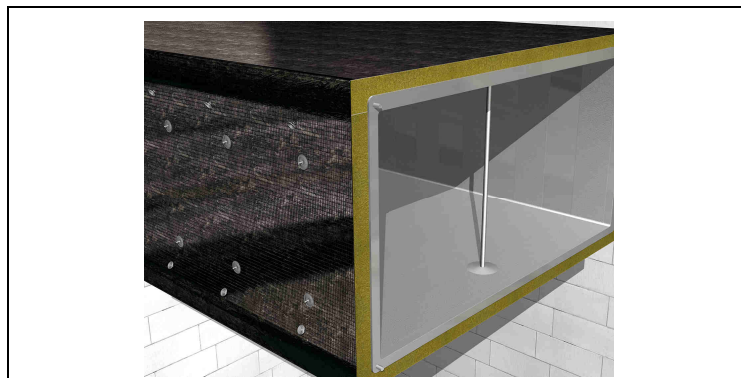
Example of Ultimate Protect Slab 4.0 Alu 1 installation.
